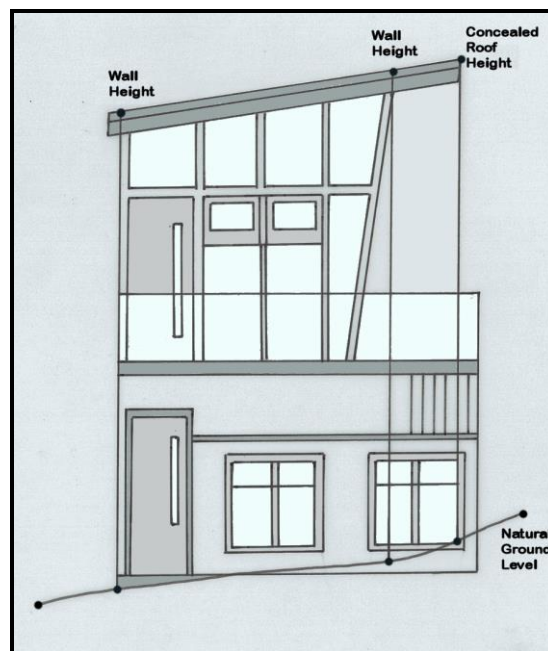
The Measurement of Wall and Roof Heights for Concealed Roof Development.
